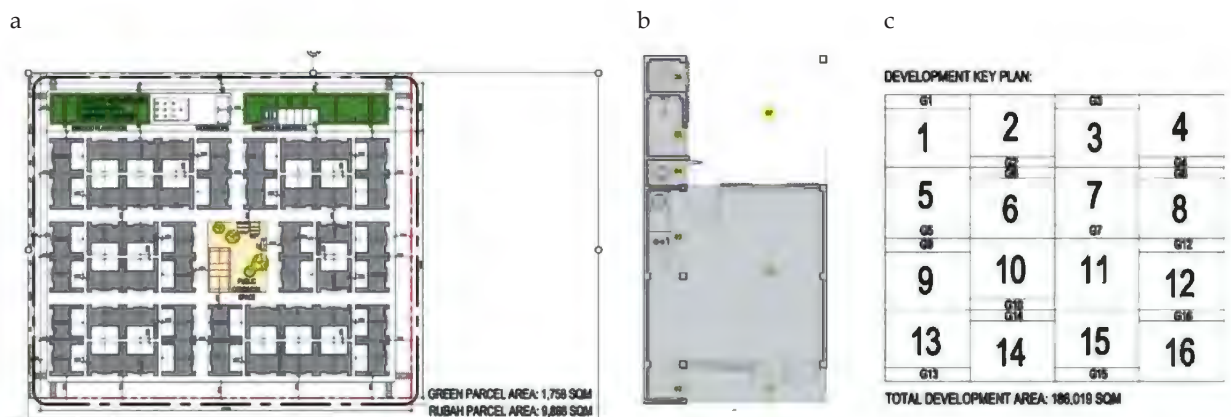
a – The area is divided into 16 plots; b – one of the plots; c – plan of the house
